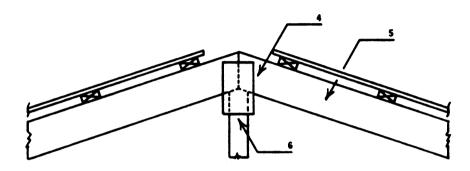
Location of test sites, Barn A. Truss No. 2, 21.9m (72') from north end. South elevation. Molded flashing not shown.
